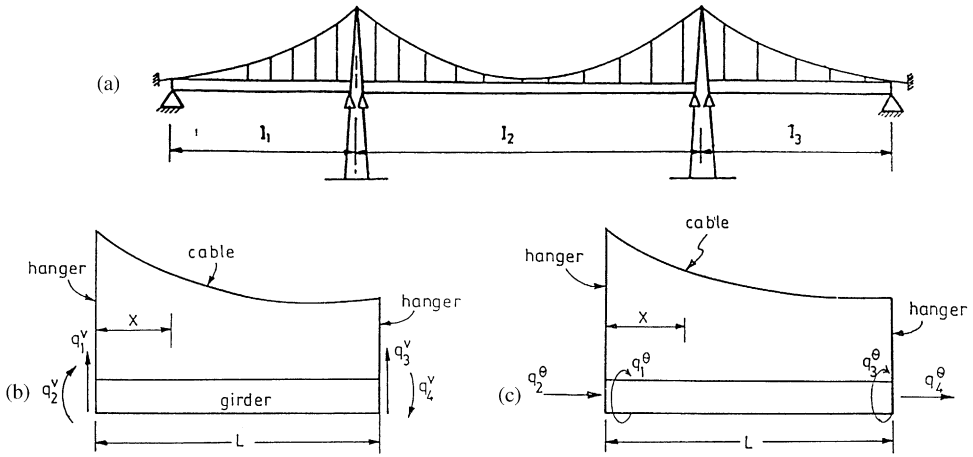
(a) Suspension bridge model; (b) bridge element with vertical displacement; (c) bridge element with torsion.
